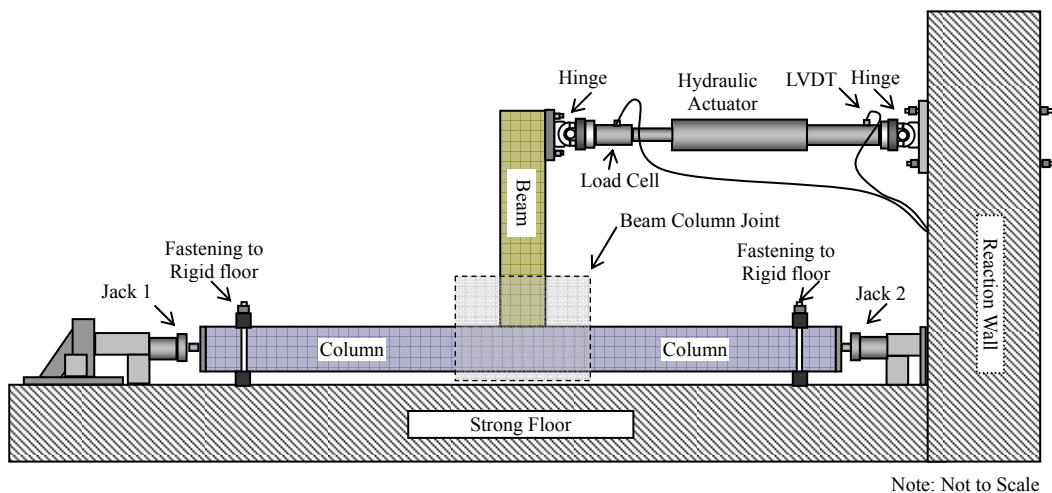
Schematic Quasi-Static Test Setup of Beam Column Joint
